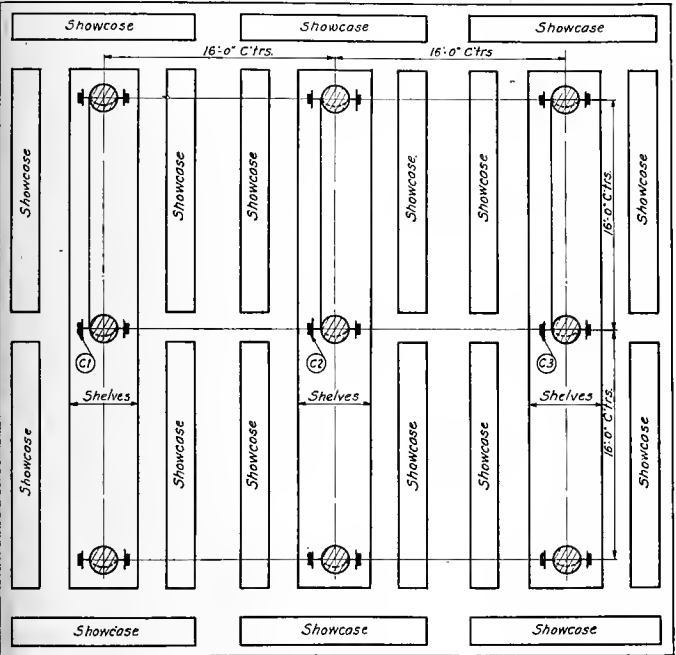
Typical floor plan of store showing location of outlets at columns for extensions to show cases.
